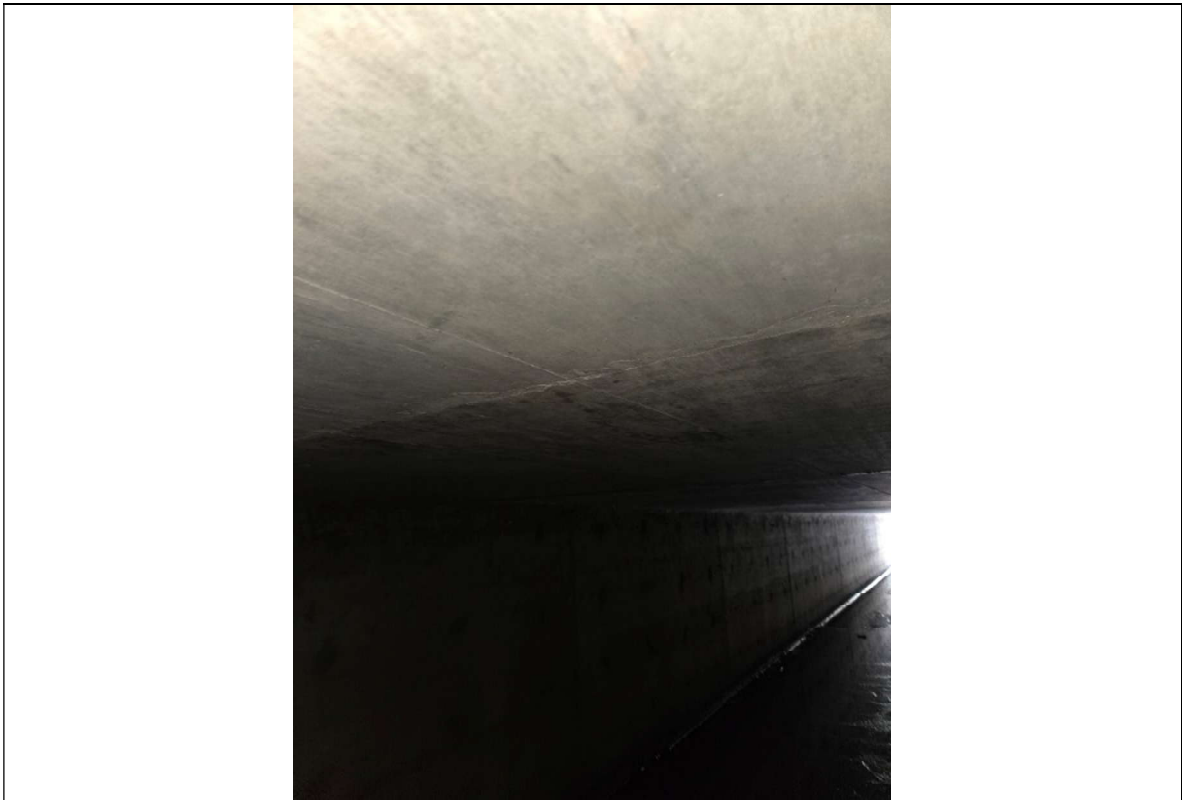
| Spalled concrete within channel concrete floor.
